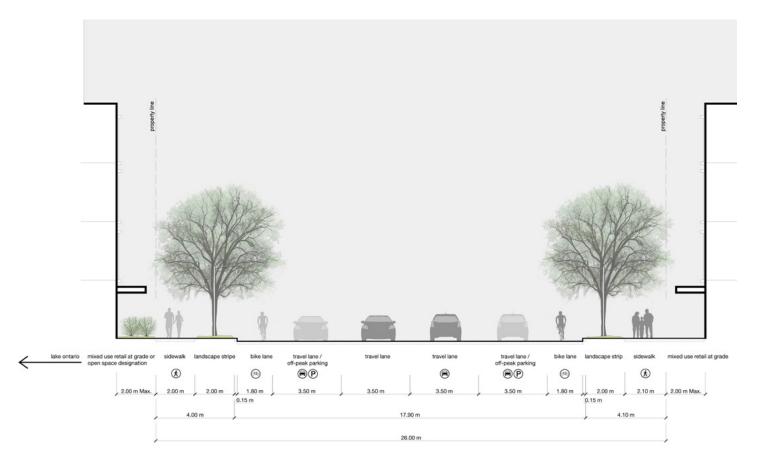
Winston Road Main Street from Hunter Road to Windward Drive
